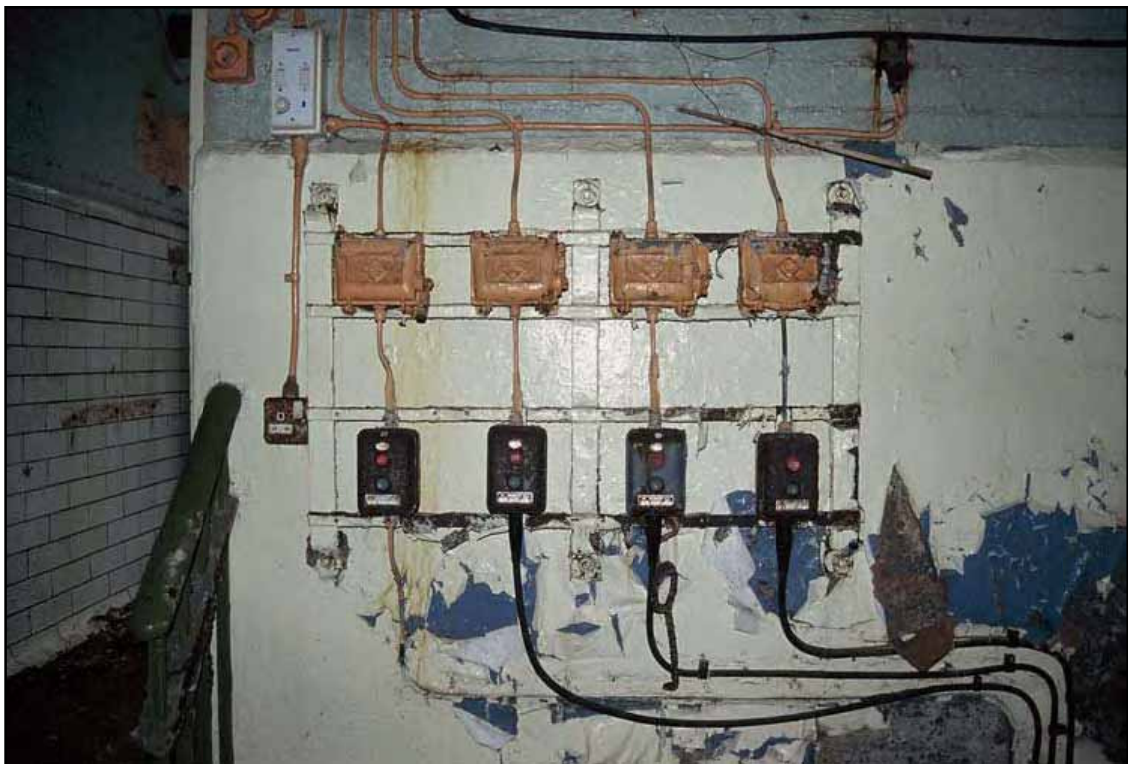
Detail electrical switches on west wall of room 3; note banister to left (slide 11)
